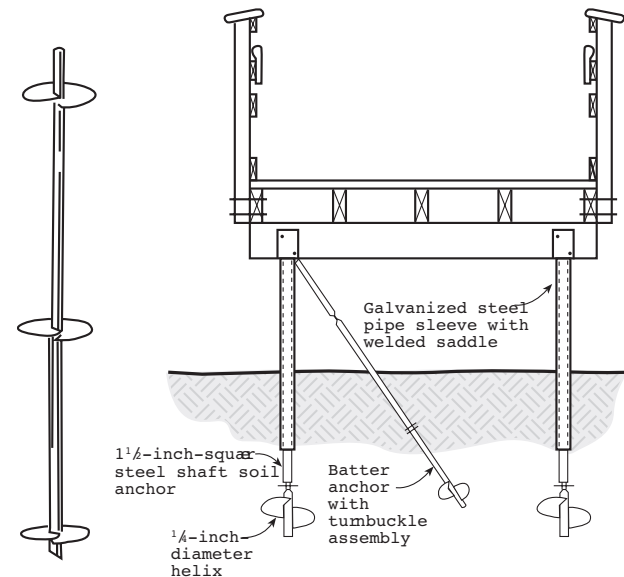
Metal screw piles can give reliable support to boardwalk structures in soft ground and do not need to be driven as deeply as traditional log pilings. (Wetland Trail Design and Construction, 2001)
